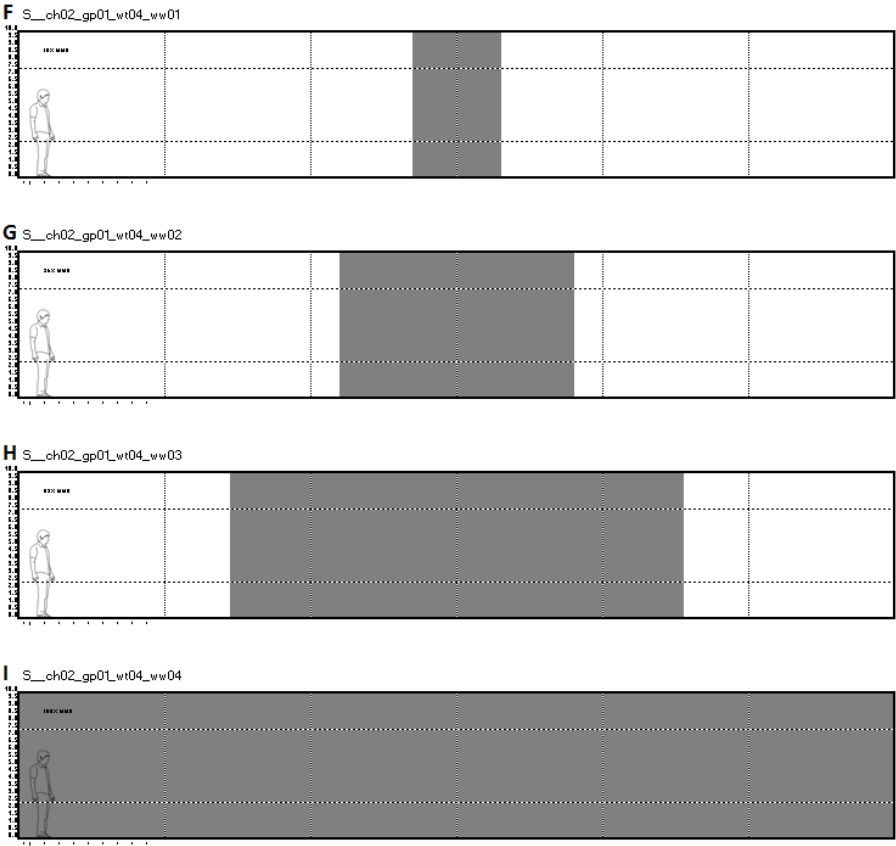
Grouped Windows: 10ft ceiling Ht, 2.5ft head - ceiling ht, 10%-26%-52% WWRs
